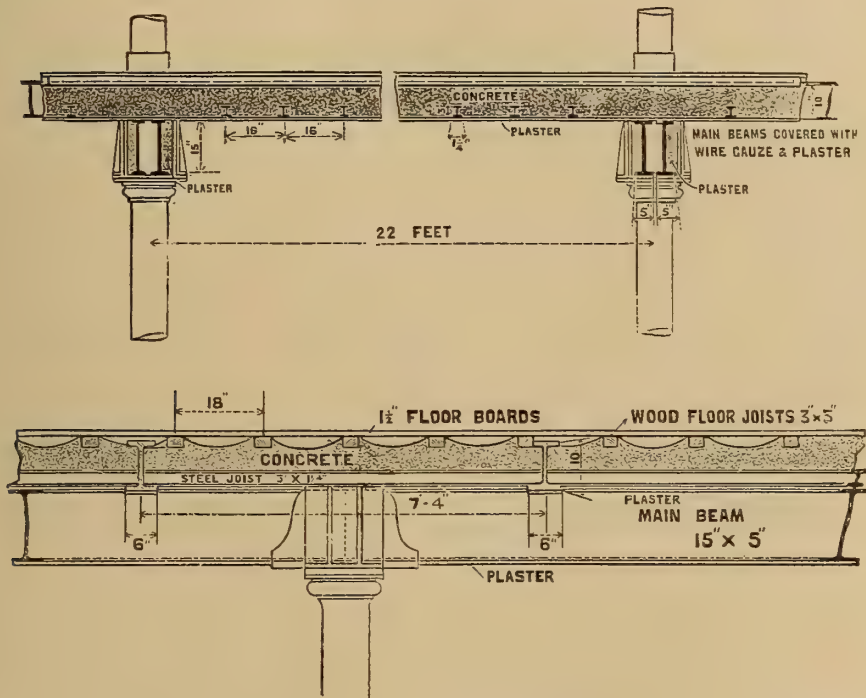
CEILING WITH STEEL GIRDERS, AND FLAT CONCRETE CEILING WITH SMALL STEEL JOISTS, BAYS 22 FEET X 14 FEET. PLATT BROS., OLDHAM
